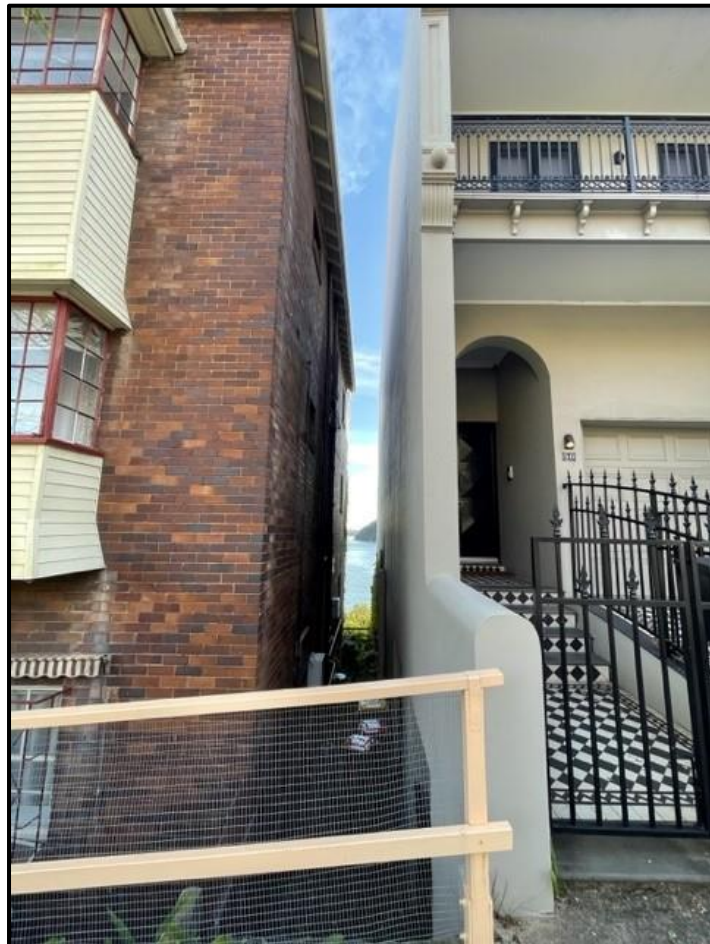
Existing view corridor (towards foreshore) and gap between buildings at No. 50 and 46 Blues Point Road
